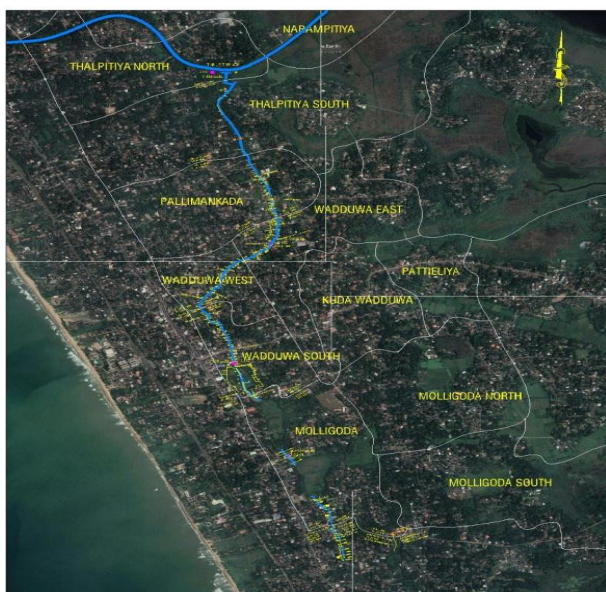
Layout Plan for Bindunu Ela Drainage Improvement Project
